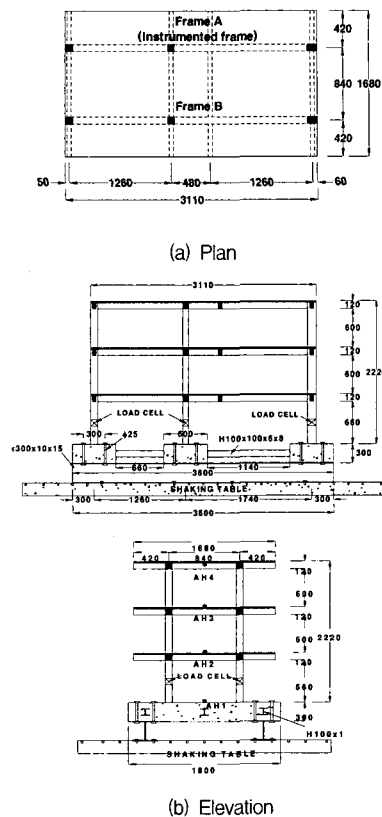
1:5 scale three-story RC structure (unit: mm)
